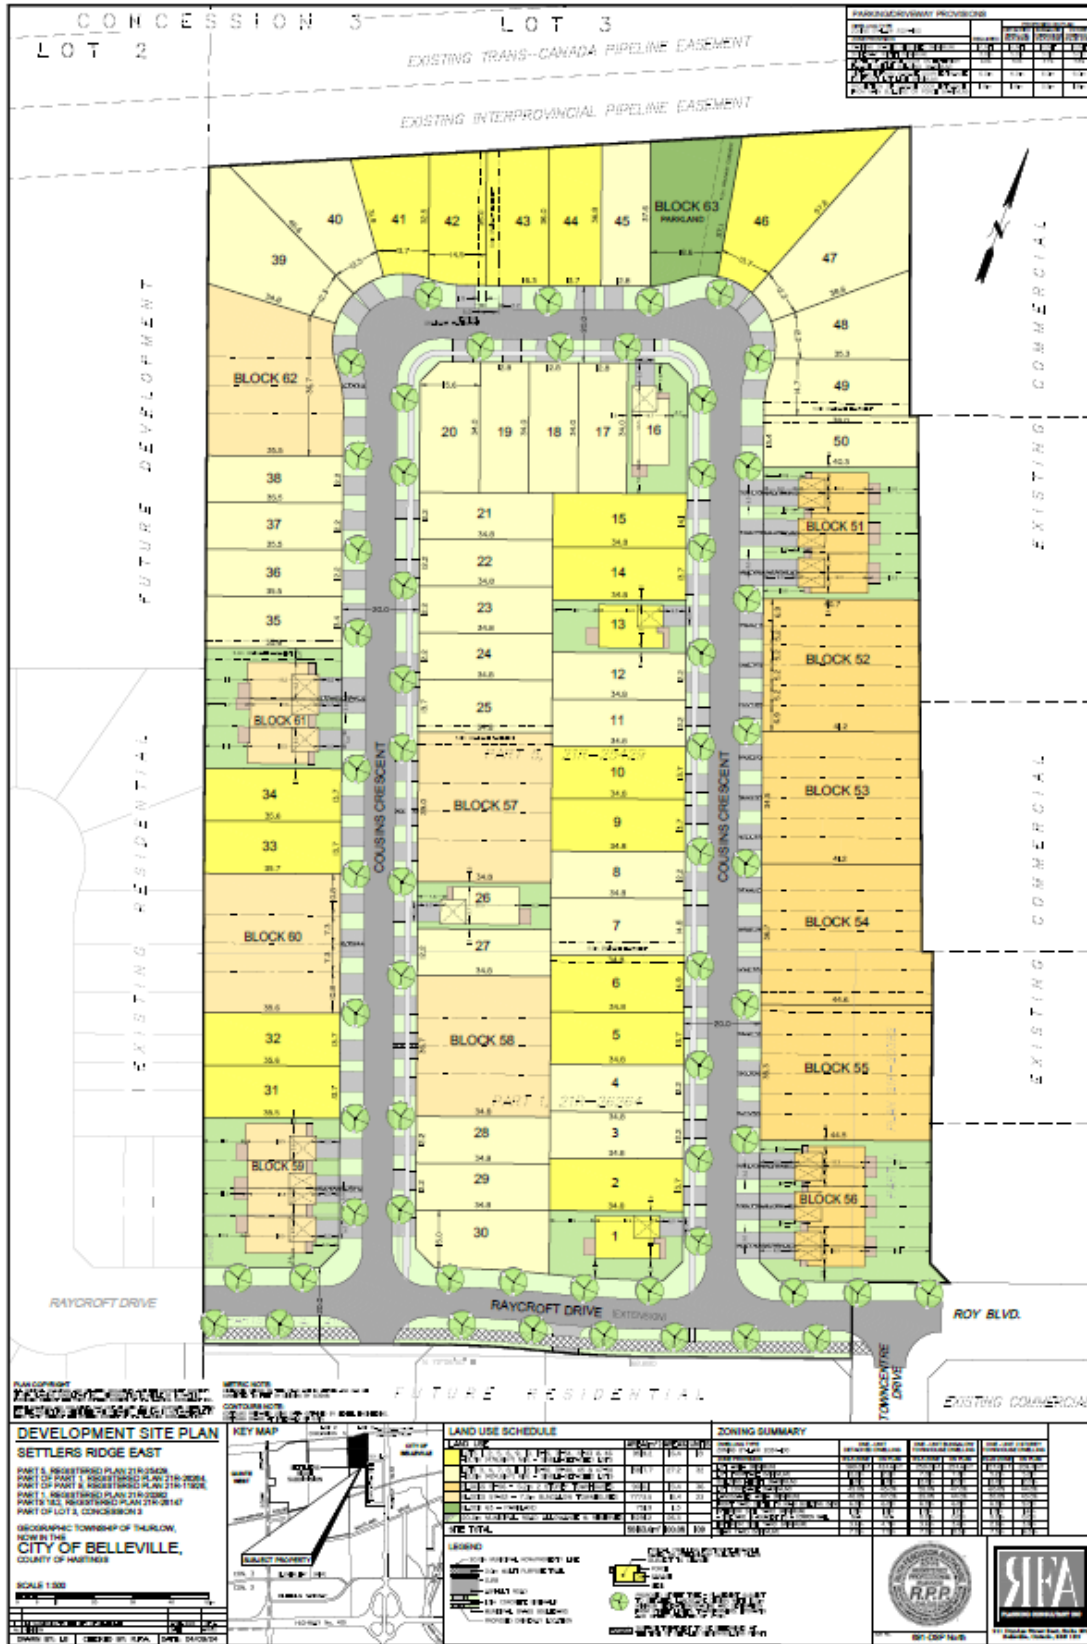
Settlers Ridge East – Phase 3 Concept Plan
